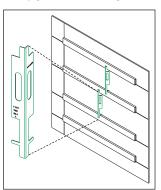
Use Horizontal Tube Layout Jig for Subsequent Rows
